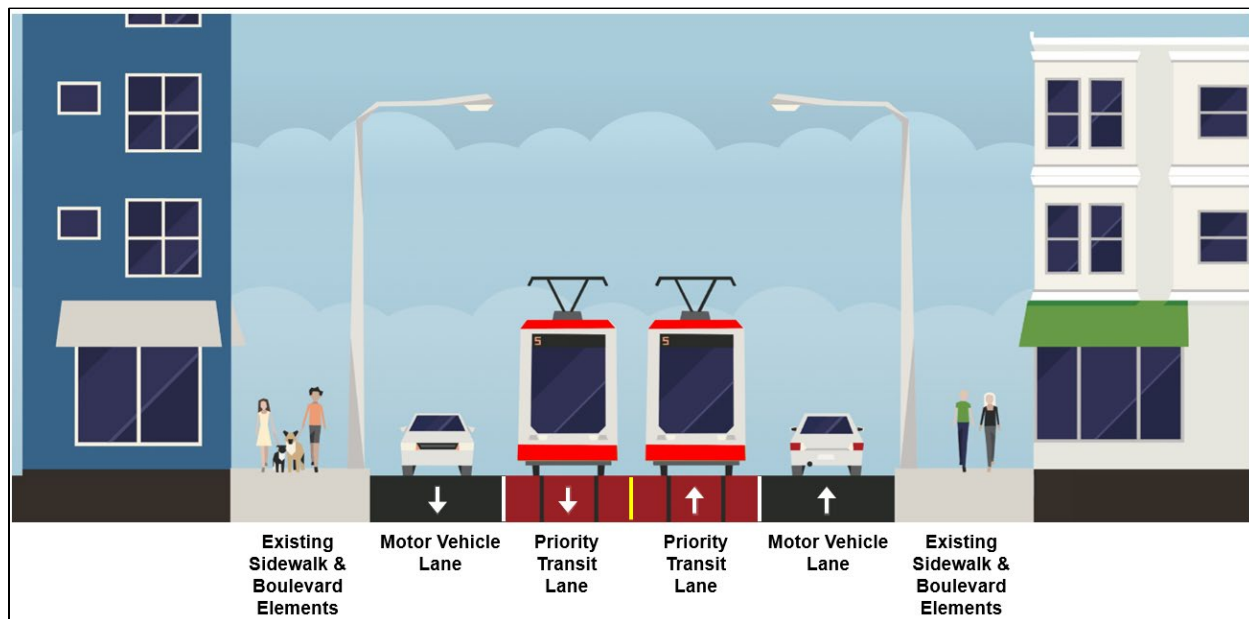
A typical cross-section of the recommended priority streetcar lanes on Bathurst Street south of Bathurst Station
